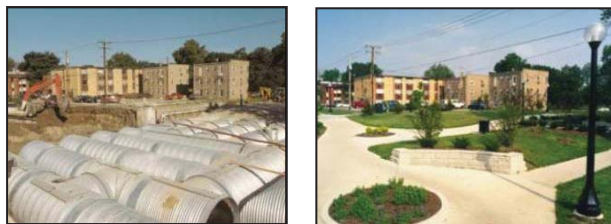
Subsurface infiltration: Construction (left) and after (right)
